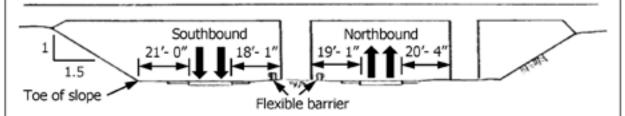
Bridge elevation view of horizontal clearances for separate southbound and northbound highway features below the bridge, with flexible barriers.
